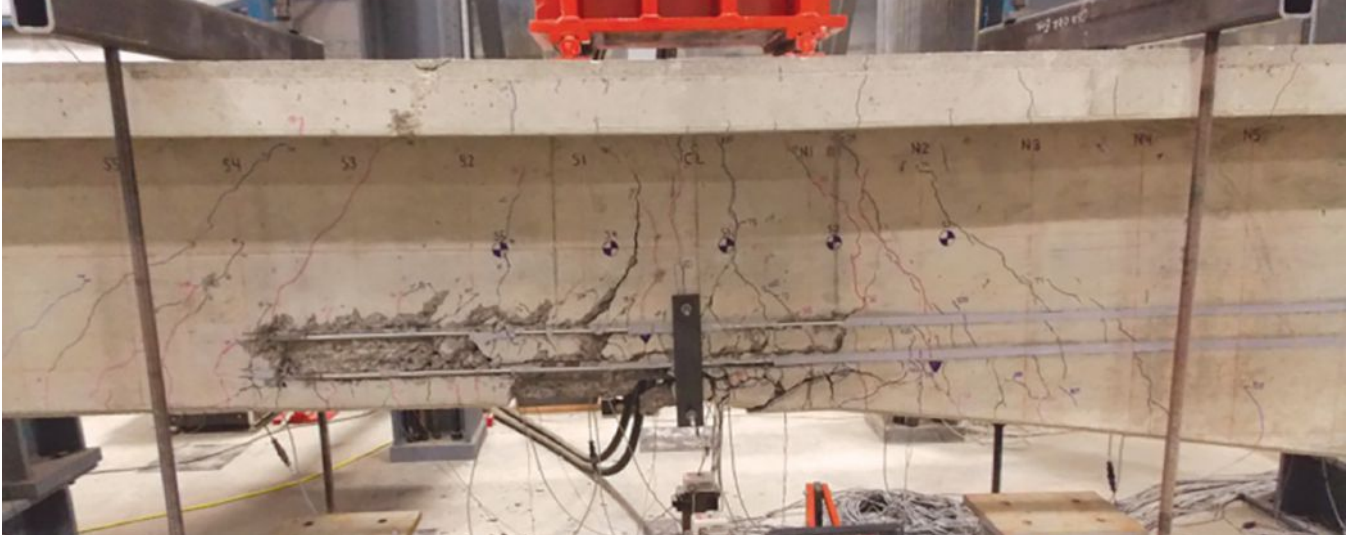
Condition of the replica of the Mosier bridge girder strengthened with near-surface-mounted titanium alloy reinforcing bars at failure in the Oregon State University laboratory. Large deformations and extensive distress give clear visual warning before ultimate failure. Photo: C. Higgins, Oregon State University.
